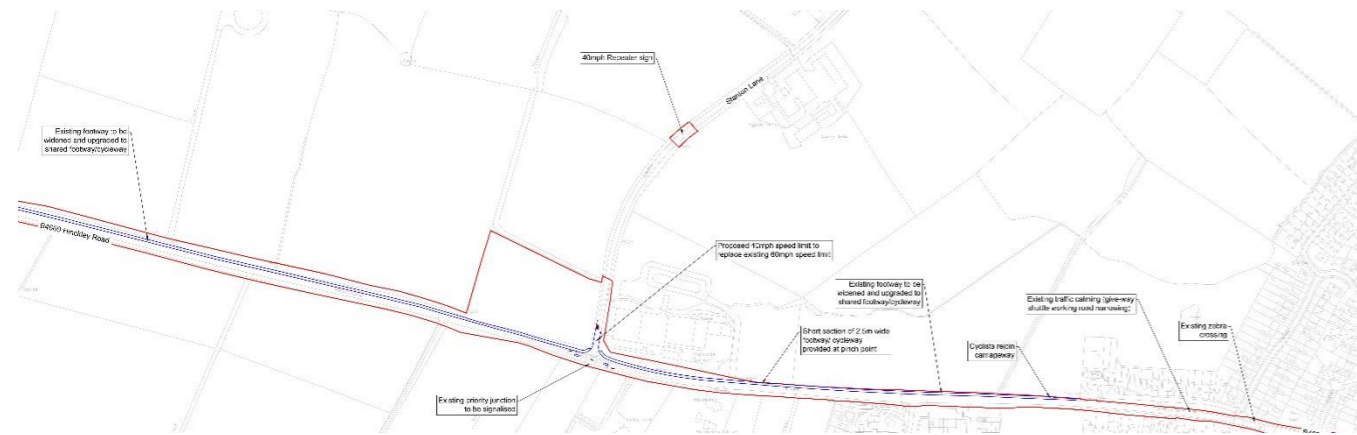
Proposed Works to the Hinckley Road, West of Sapcote
